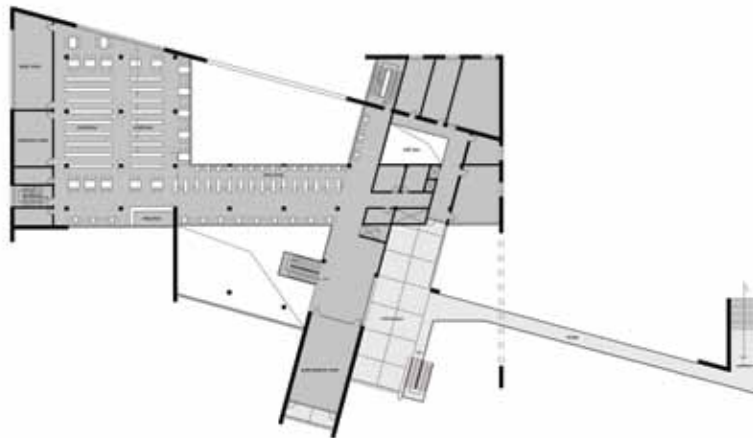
Second floor plan showing bridge across North 5th Street (Jiajian Min).
